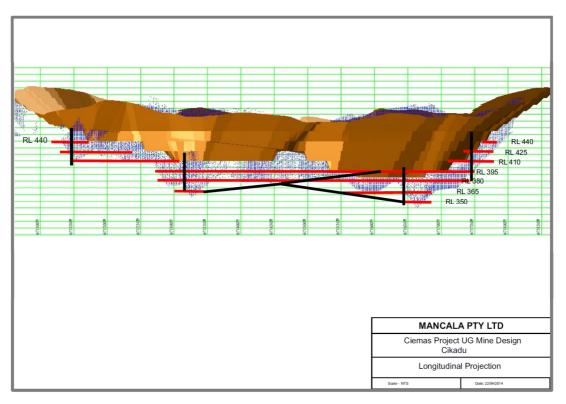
Longitudinal projection of conceptual mine design for Cikadu post open cut mining.
